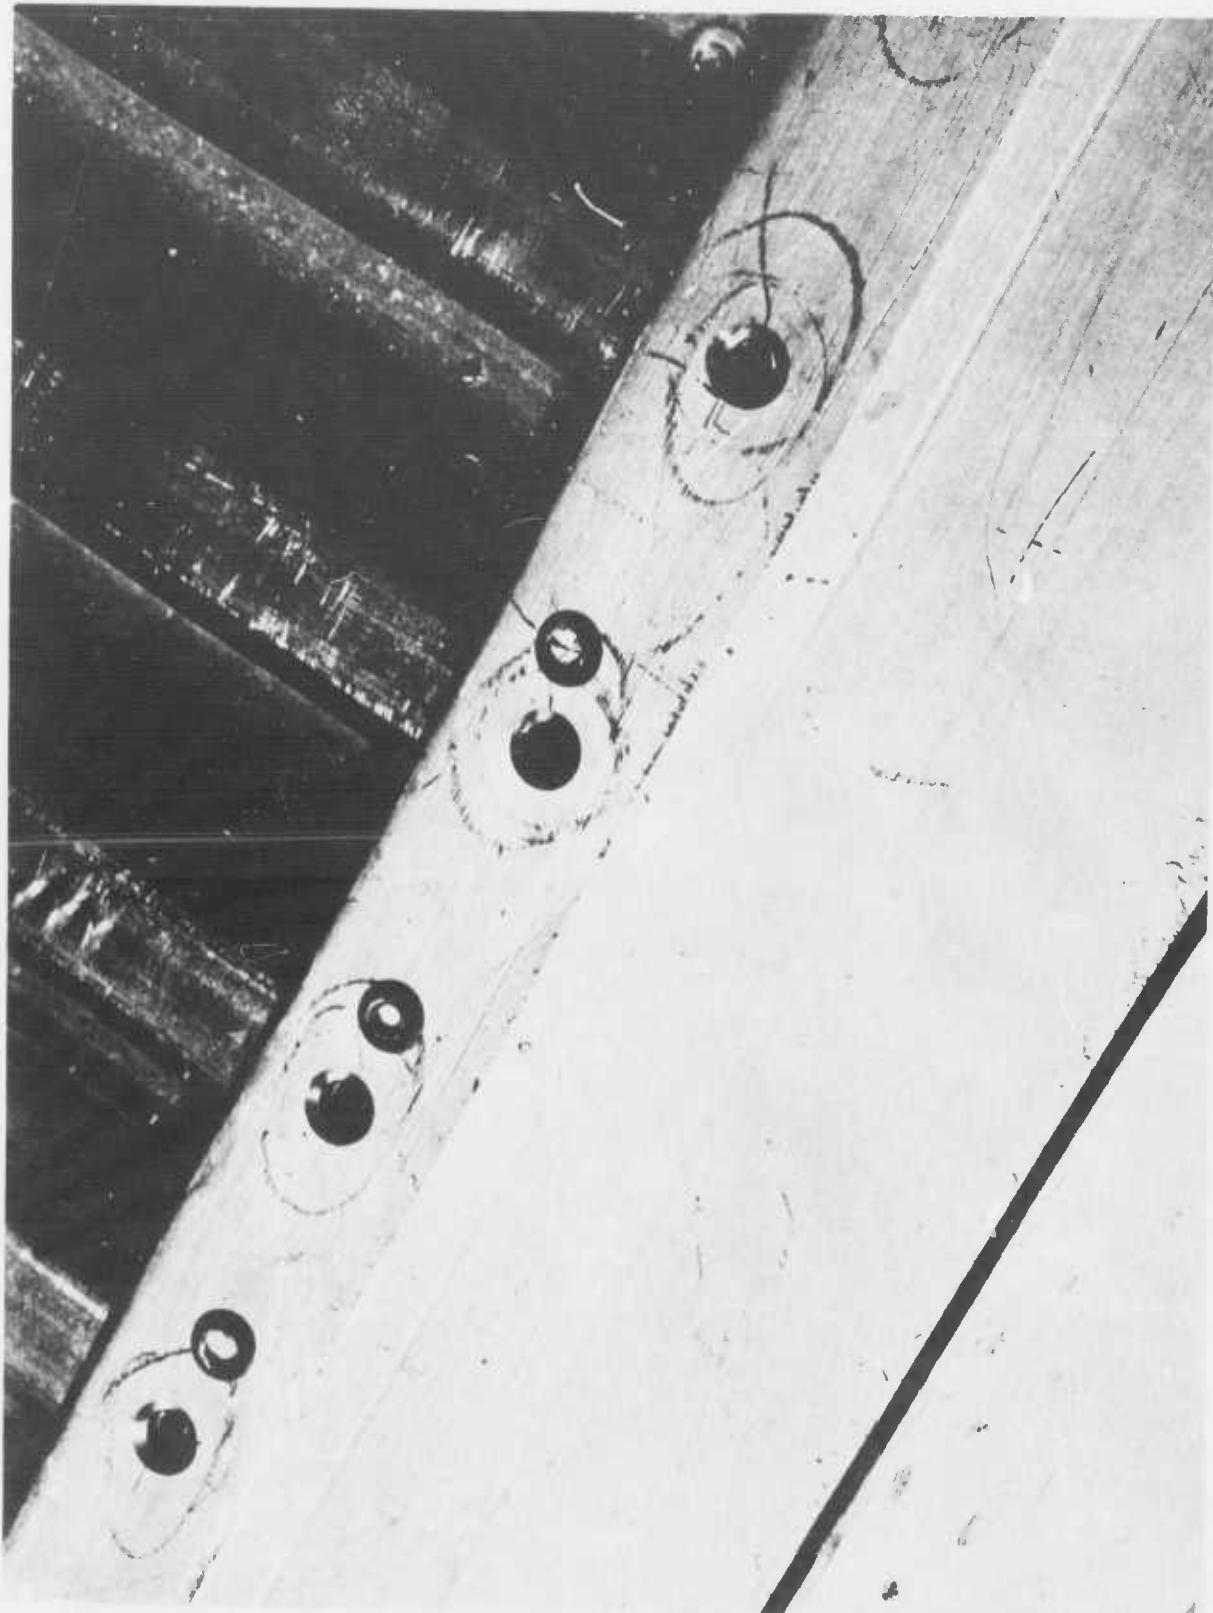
RIVET FAILURE CLOSEUP
